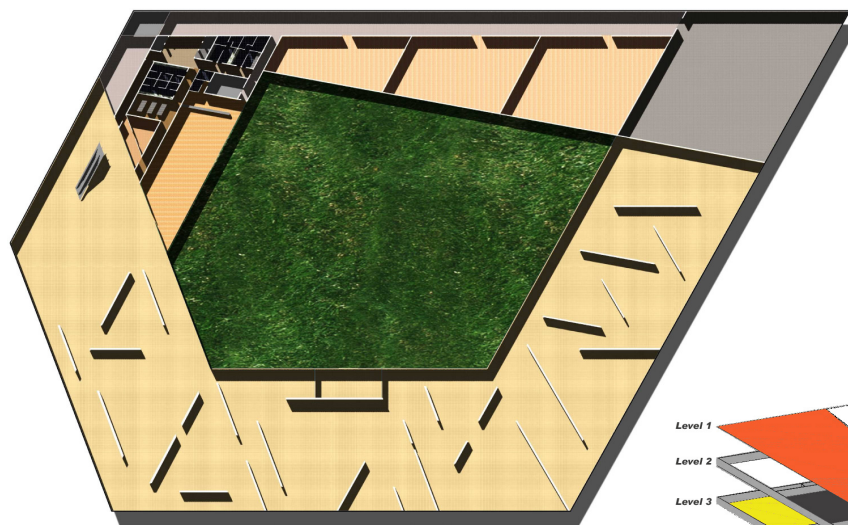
Axonometric floor plans of level 1, 2 and 3
